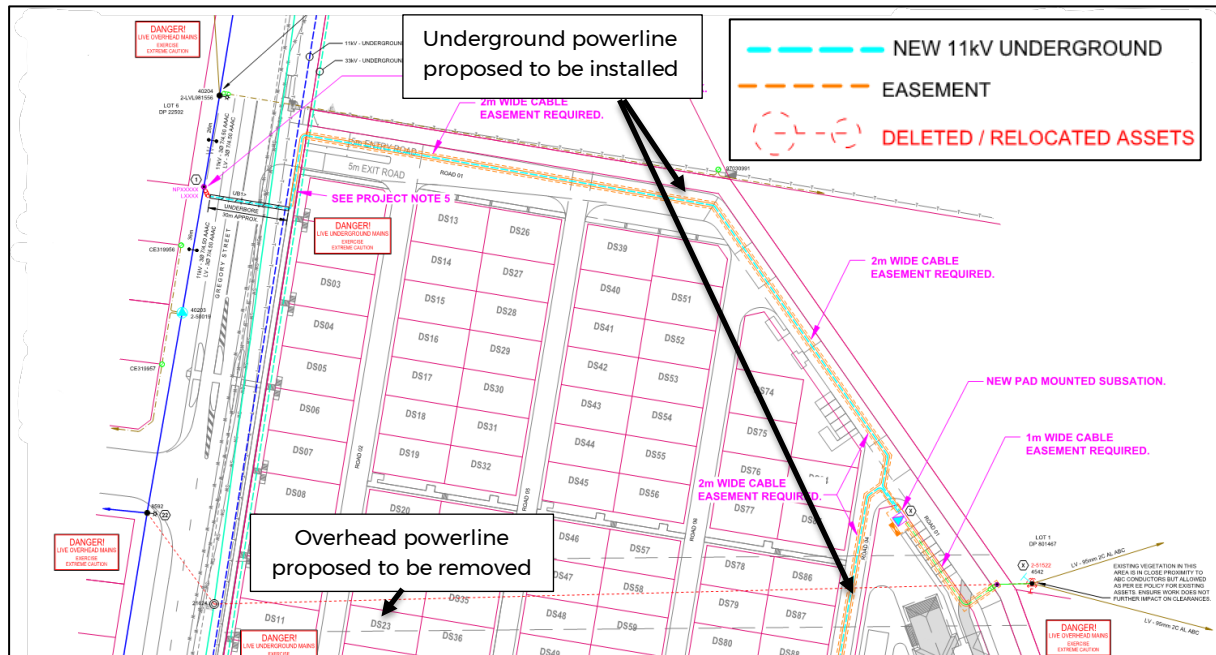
Essential Energy Reticulation Plan (Source: King + Campbell, 2025)
